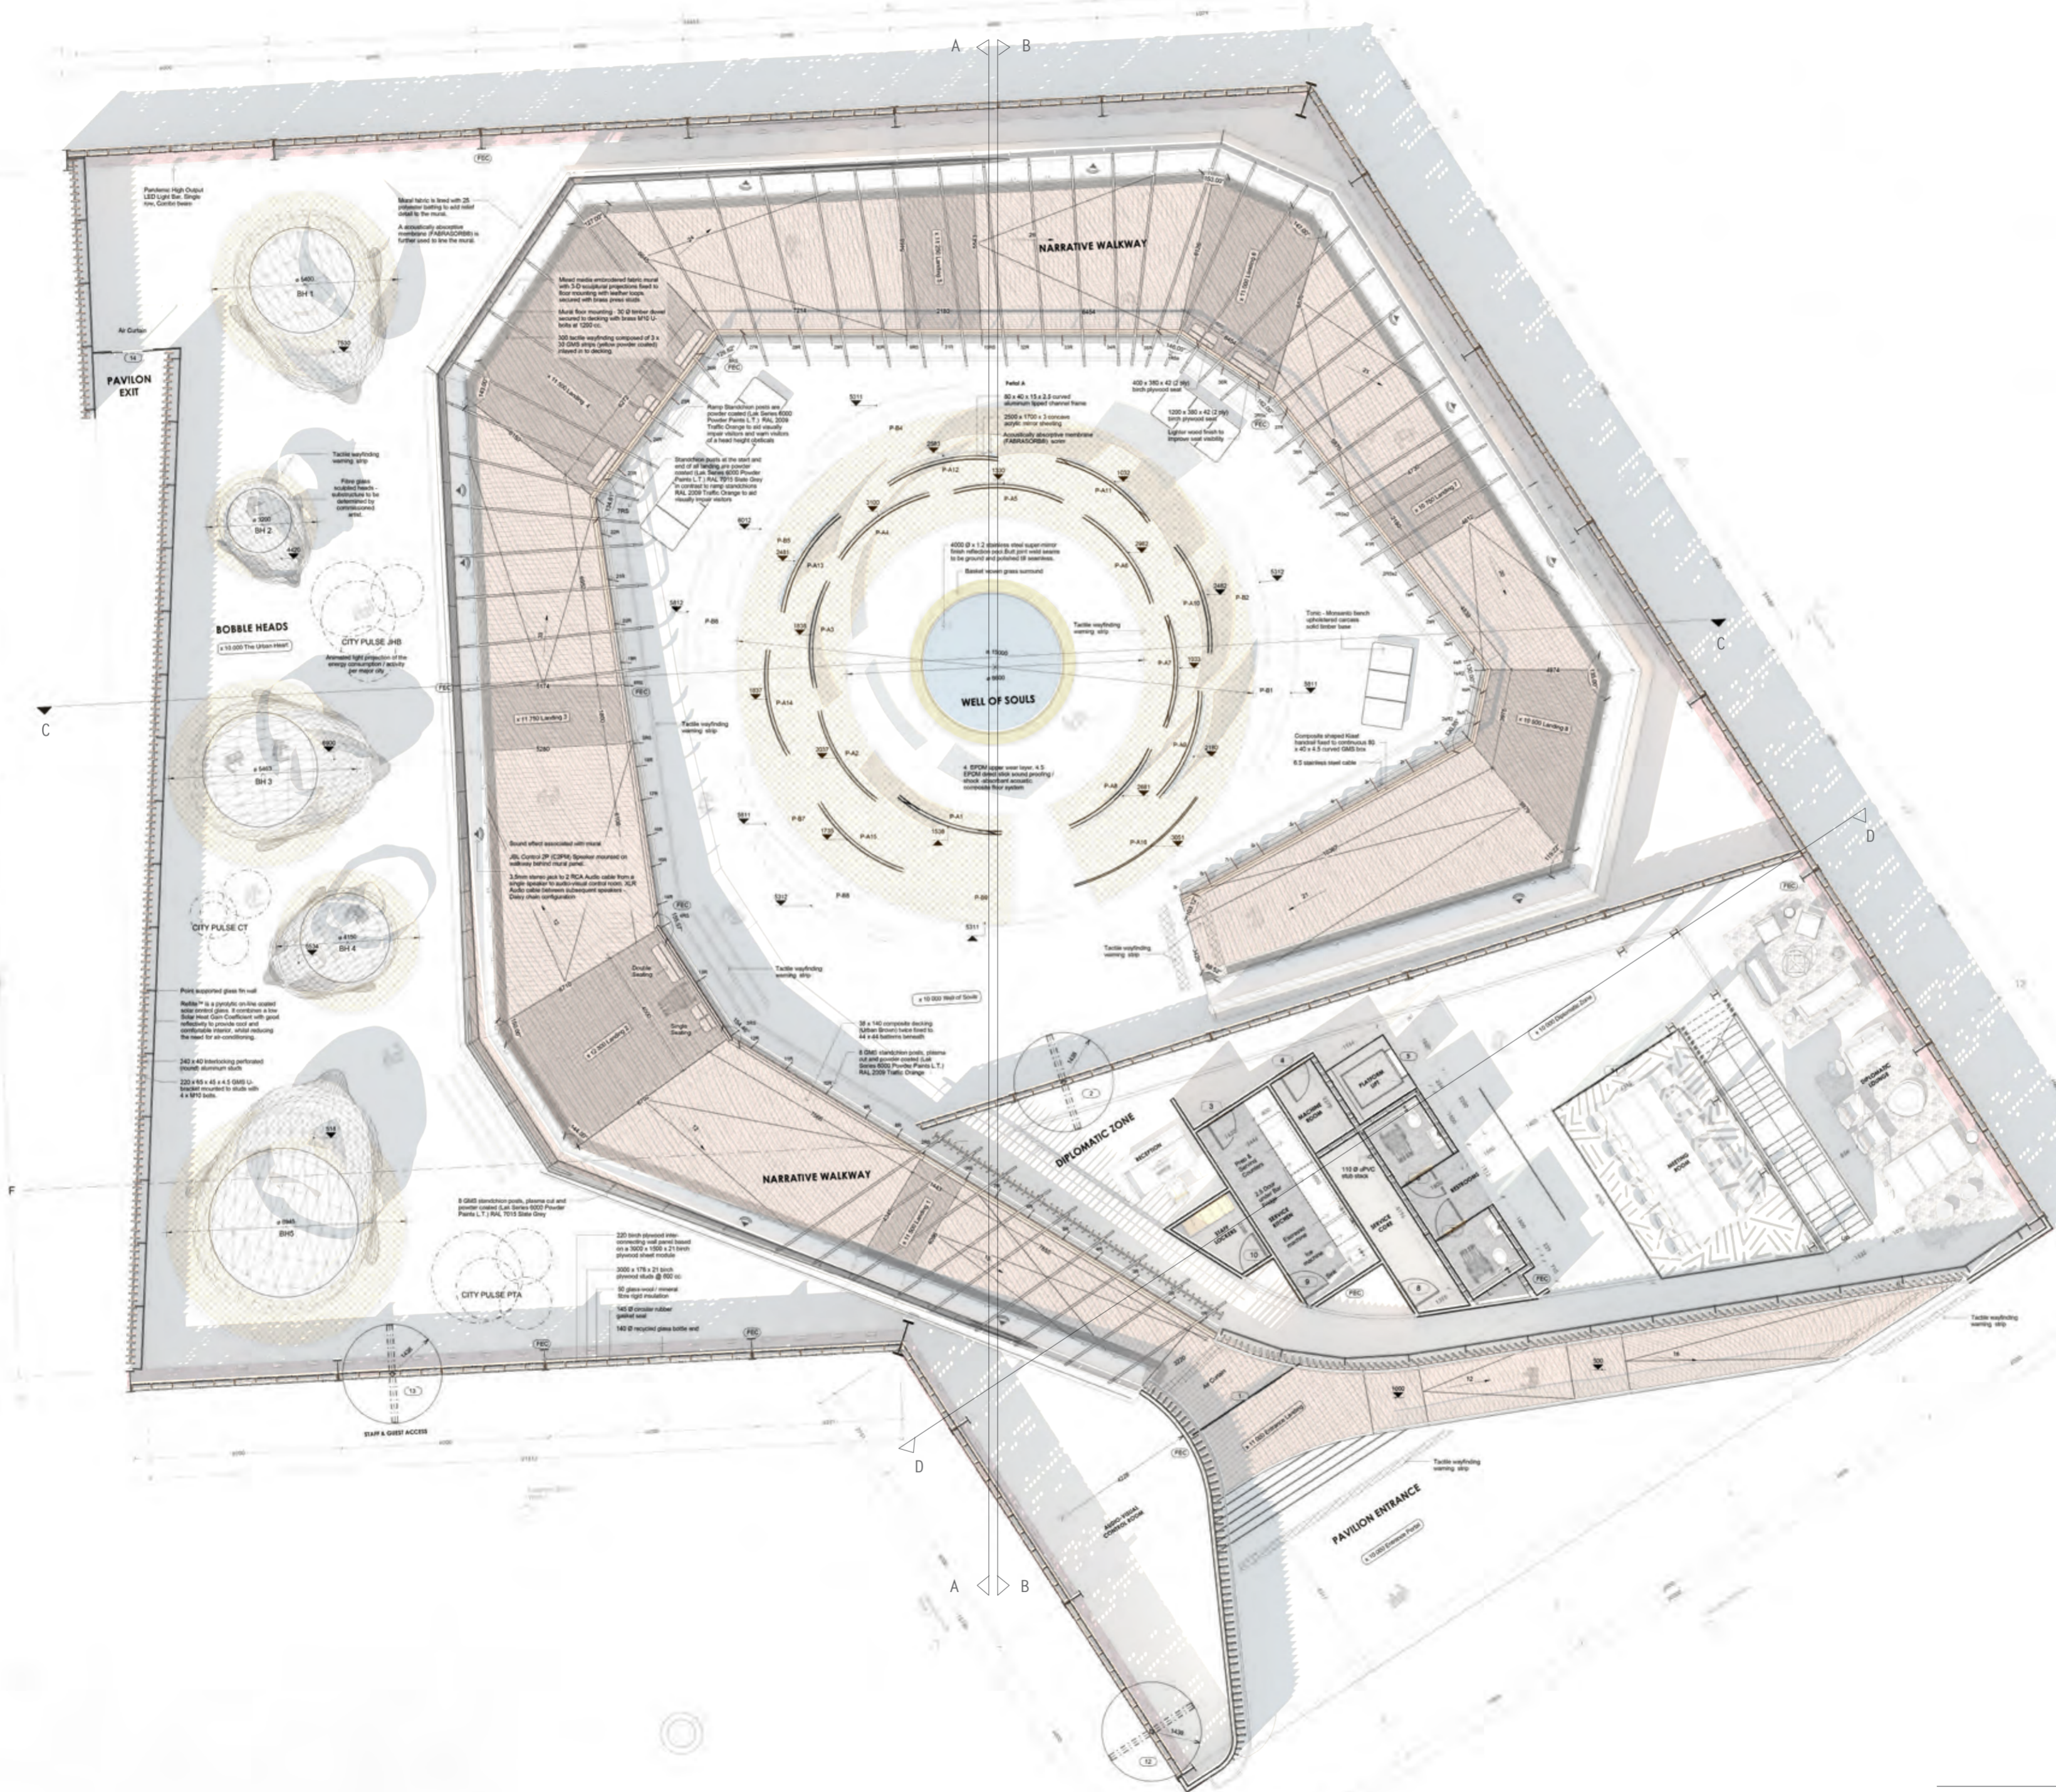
WE ARE: Ground Floor Plan _ Not to Scale
